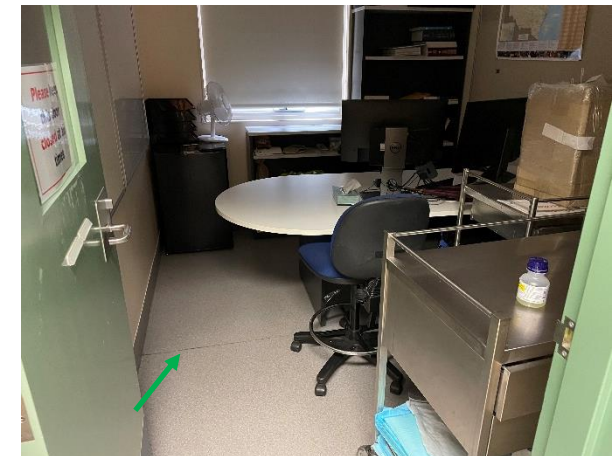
Emergency department, internal floors – Assumed non-asbestos containing grey speckled vinyl sheeting
